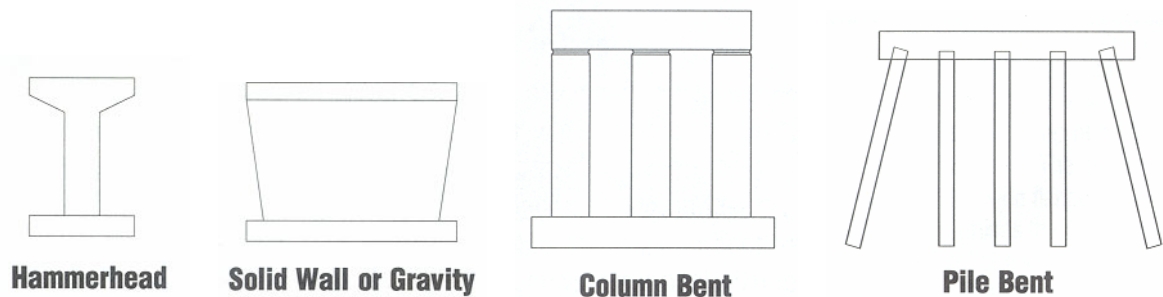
Basic types of highway bridge piers (Tonias, 1995)
